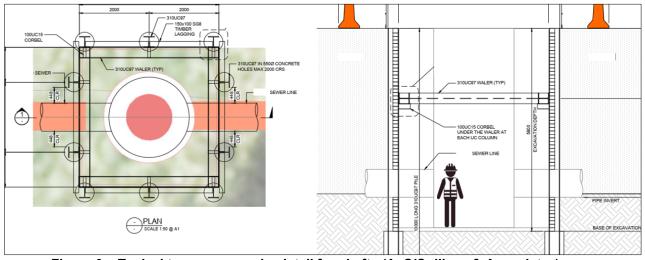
Typical temporary works detail for shafts (A. O'Sullivan & Associates)
